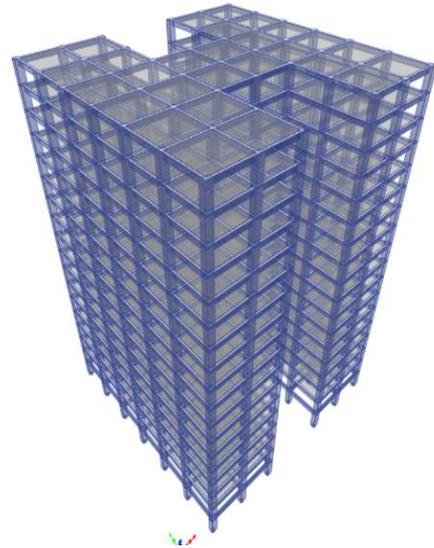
C-shaped plan of G+16 multistorey Composite structure
